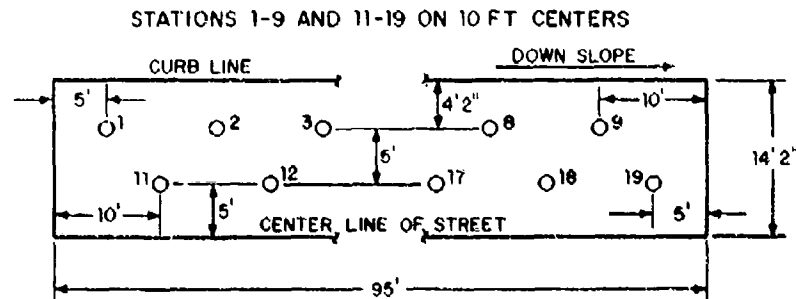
Layout of Asphalt Test Area for Engineering-Scale Tests of Flare Nozzle, Showing Survey Stations.
